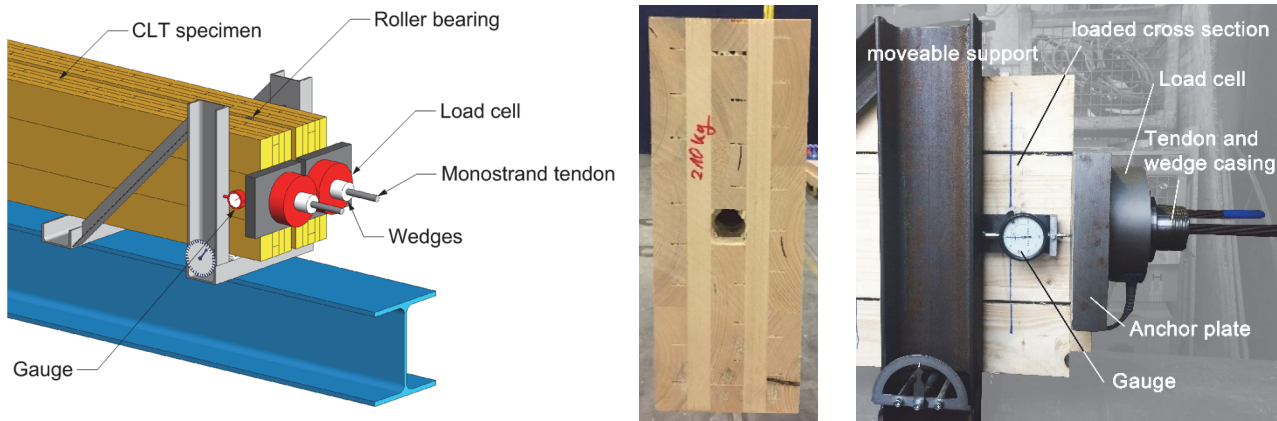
left: detail drawing of measuring devices, middle: cross section type A, right: side view of measuring devices
